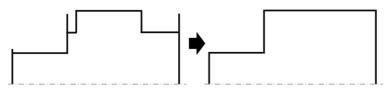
Simplification of the roof, left is roof in the reference building and right is the model used in calculations.
